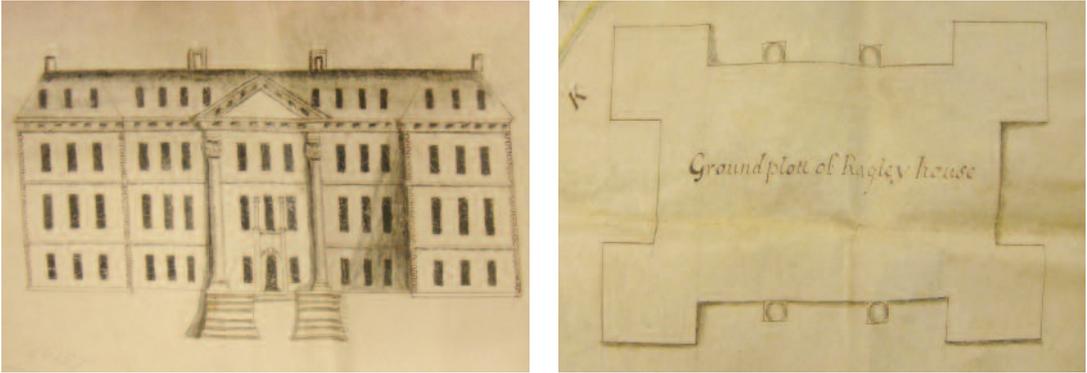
Ragley Hall, entrance front and block plan: sketches from an estate plan, late 17th century.
